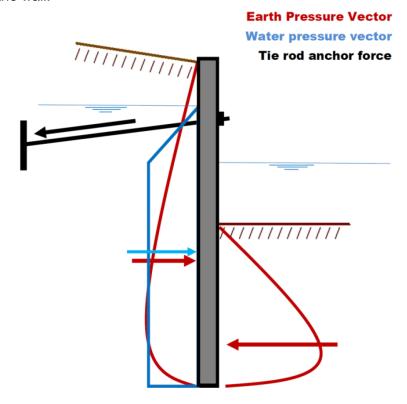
Earth pressure and hydrostatic loading schema for an anchored bulkhead
